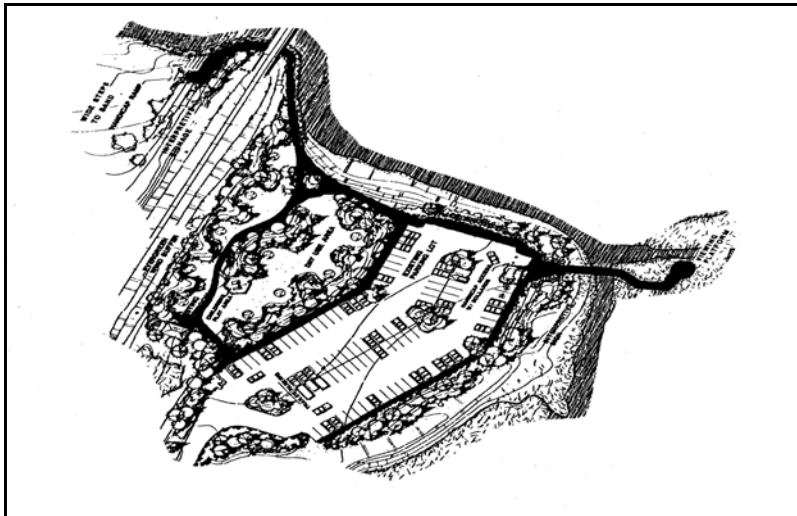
, Ocean Beach Park Master Plan, showing proposed boardwalk extending to the right (east) from the parking lot.
